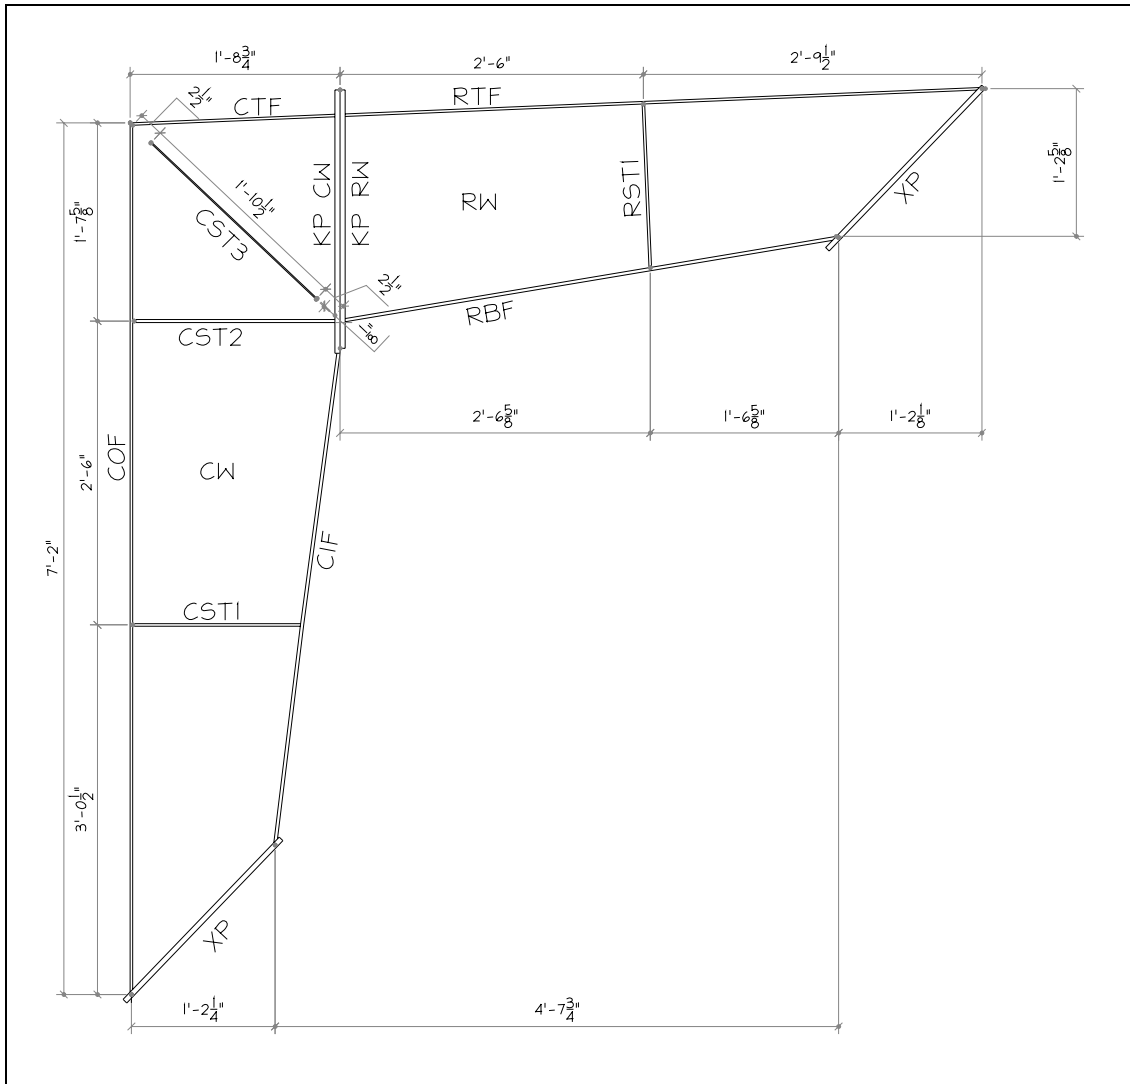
Frame showing plate fabrication nomenclature and overall dimensions
